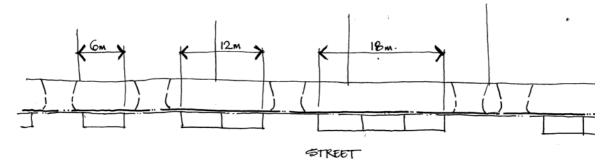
On-Street Parking Layouts for Alternate Driveway Locations.
